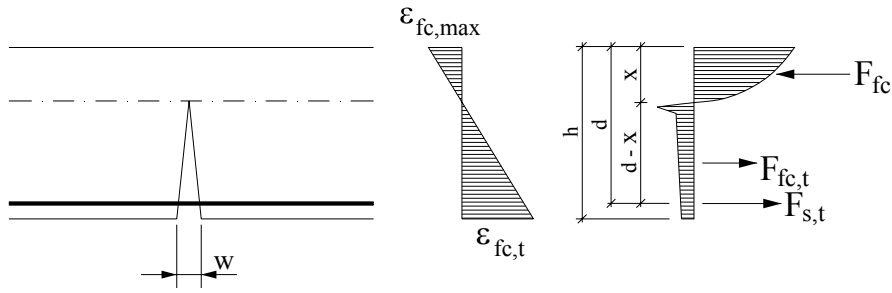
Flexural model for fibre reinforced concrete [15-17]
